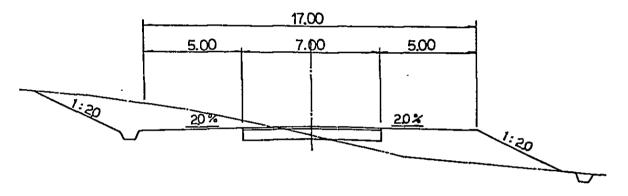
STANDARD CROSS SECTION OF ACCESS FEEDER ROAD
